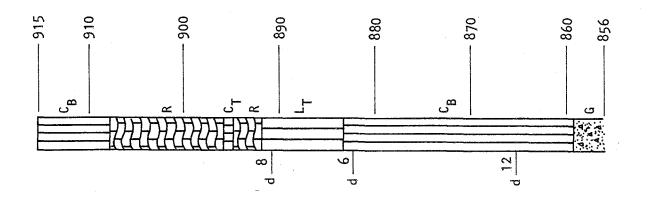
BORING NO. 3-4 AT BUILDING 3 SITE (Veterans Administration, 1952)
